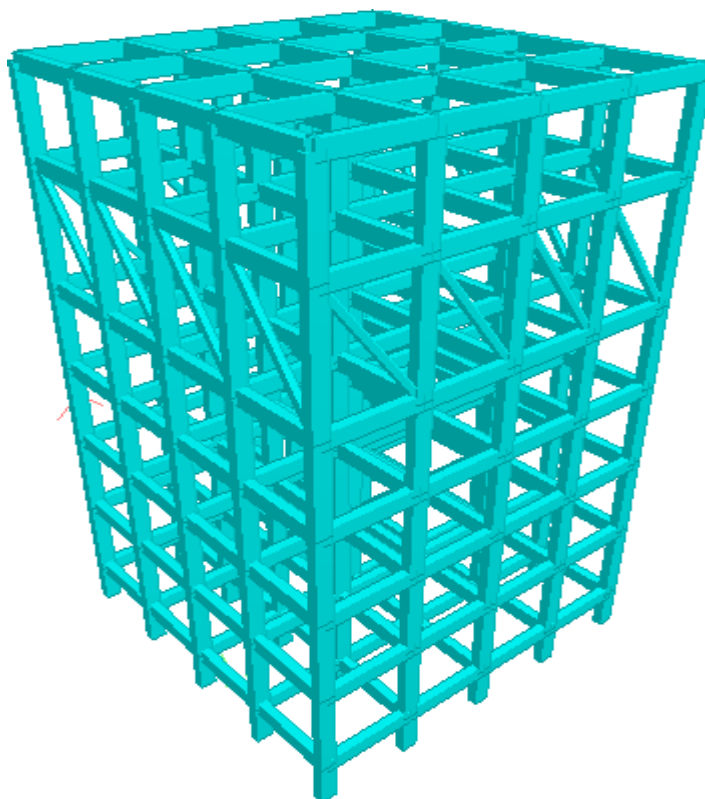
10 Second Floor Soft Storey With Inclined Column RenderView
